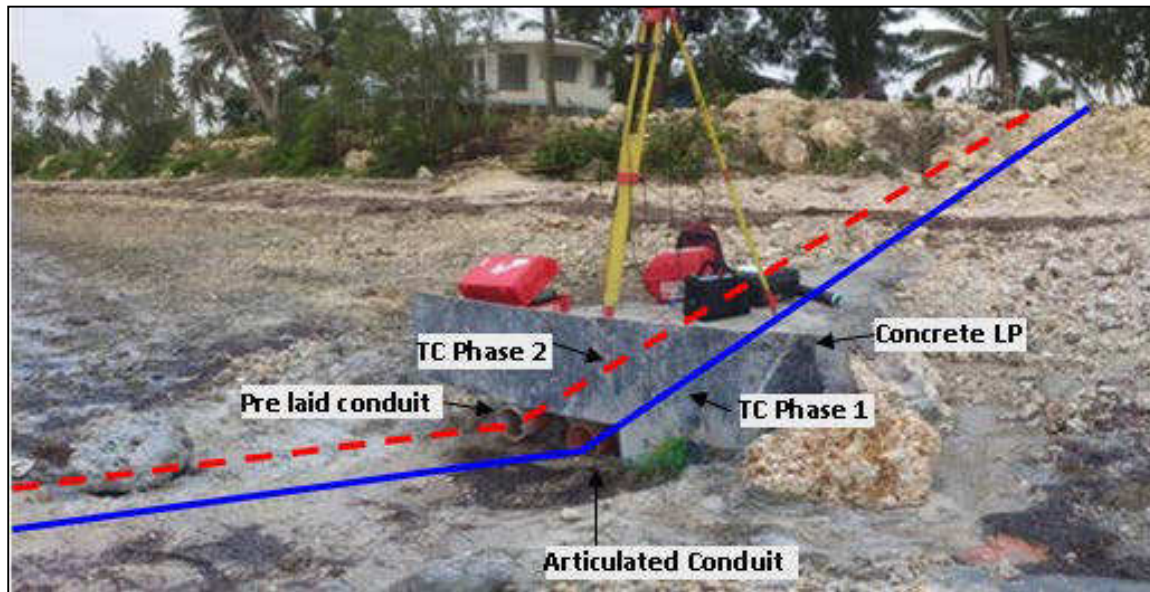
Construction works at LP, Nuku'alofa (2013). Planned new cable route is shown in red.
